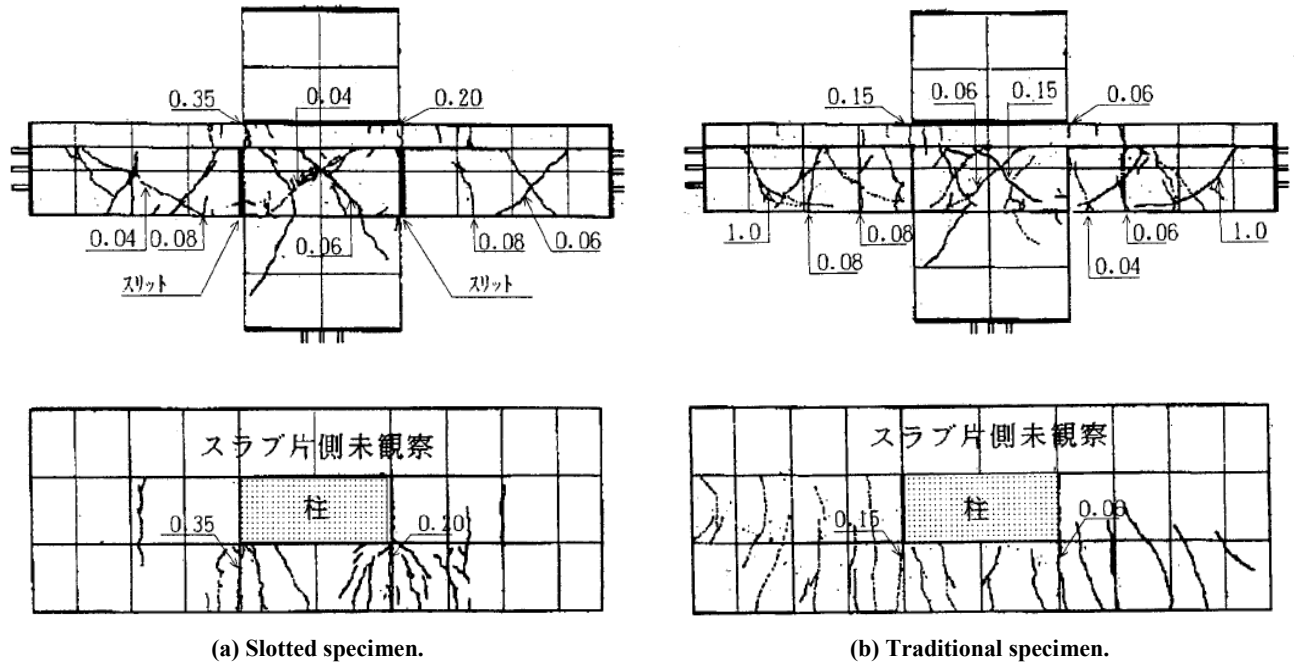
Damage to frame and floor for slotted and traditional connection types (Ohkubo et al., 1998).
